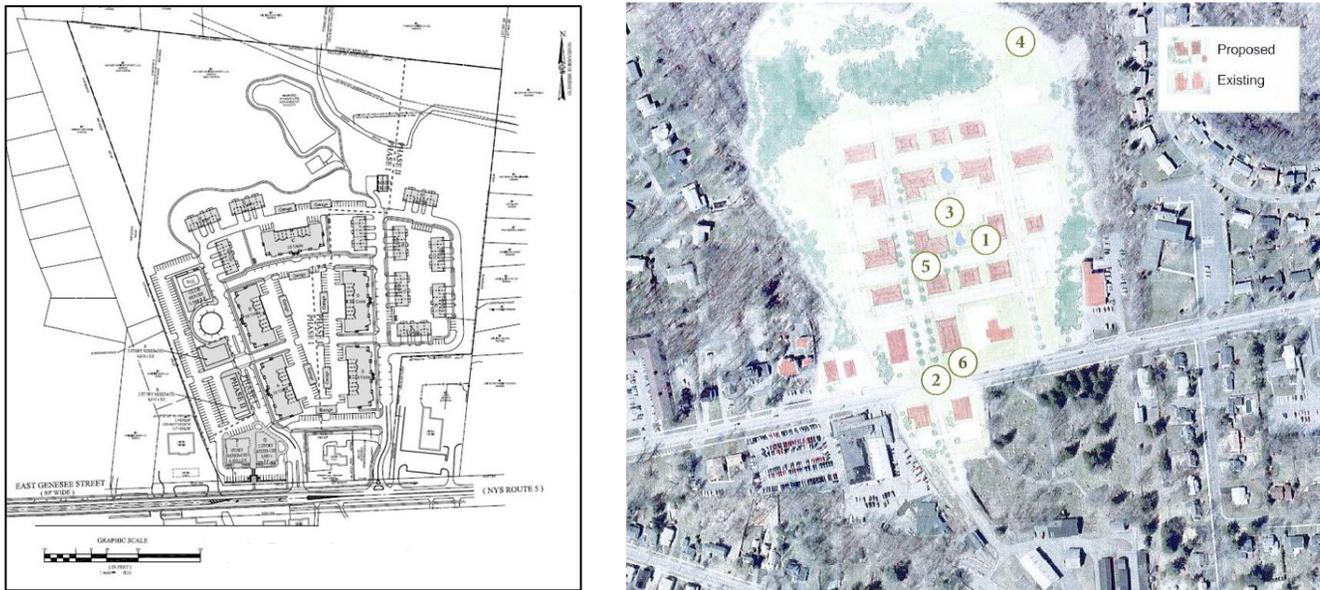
547 East Genesee Street Concept Plan (Source: Village Comprehensive Plan; Updated August 2014) compared to Project Conceptual Site Plan
